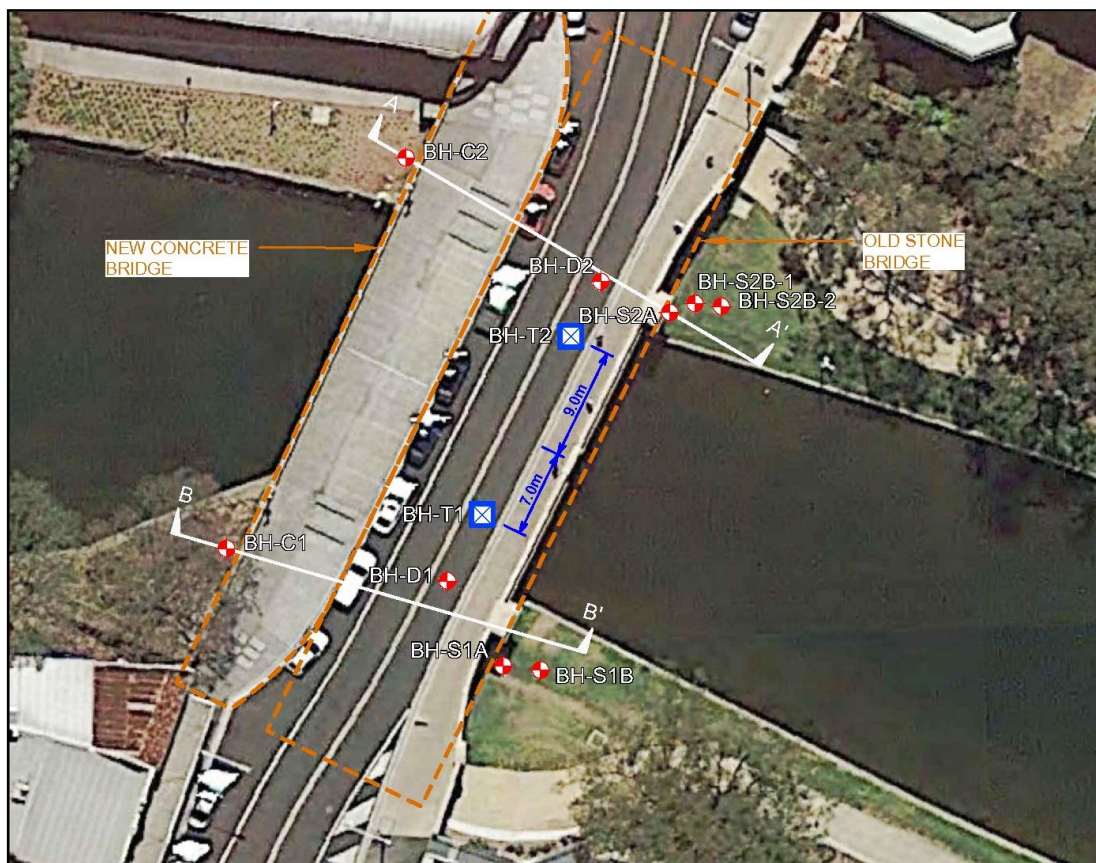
Geotechnical boreholes and trial pits at Lennox Bridge
